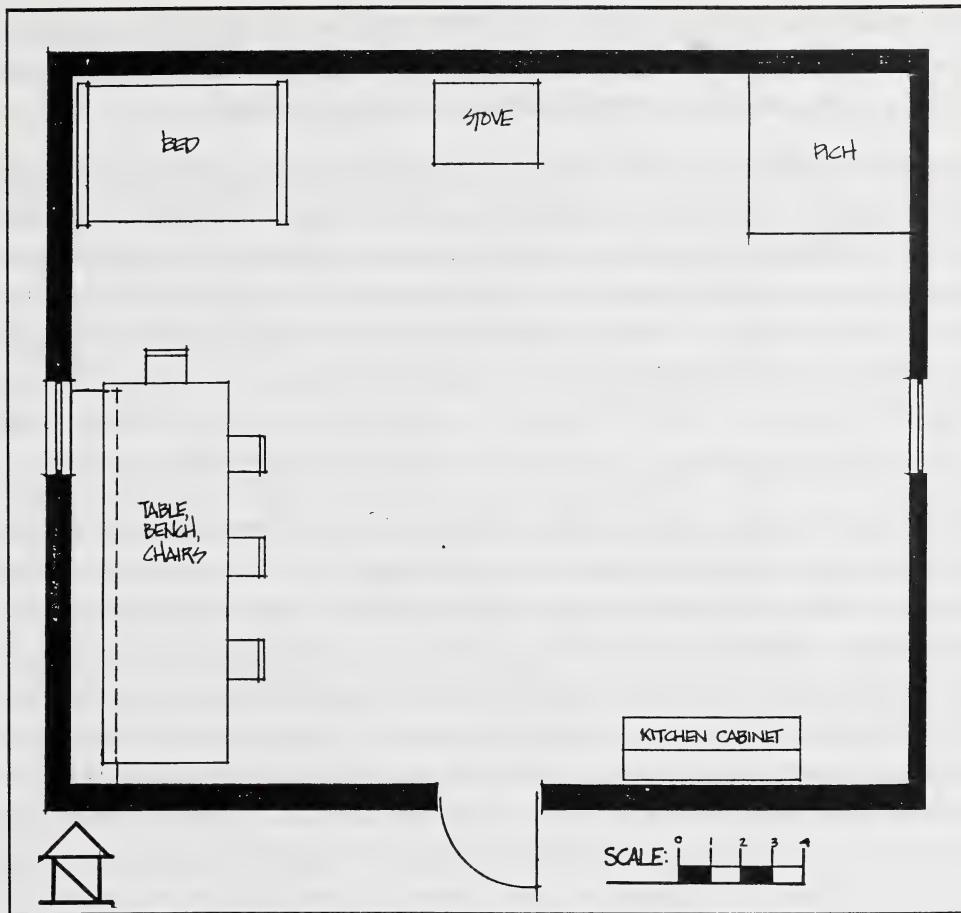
Furniture Plan of Mike Hawreliak's first summer house, ca. 1917.
